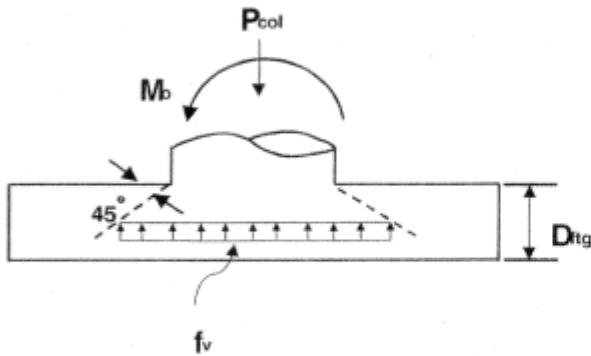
Effective Joint Width for Footing Joint Stress Calculation
